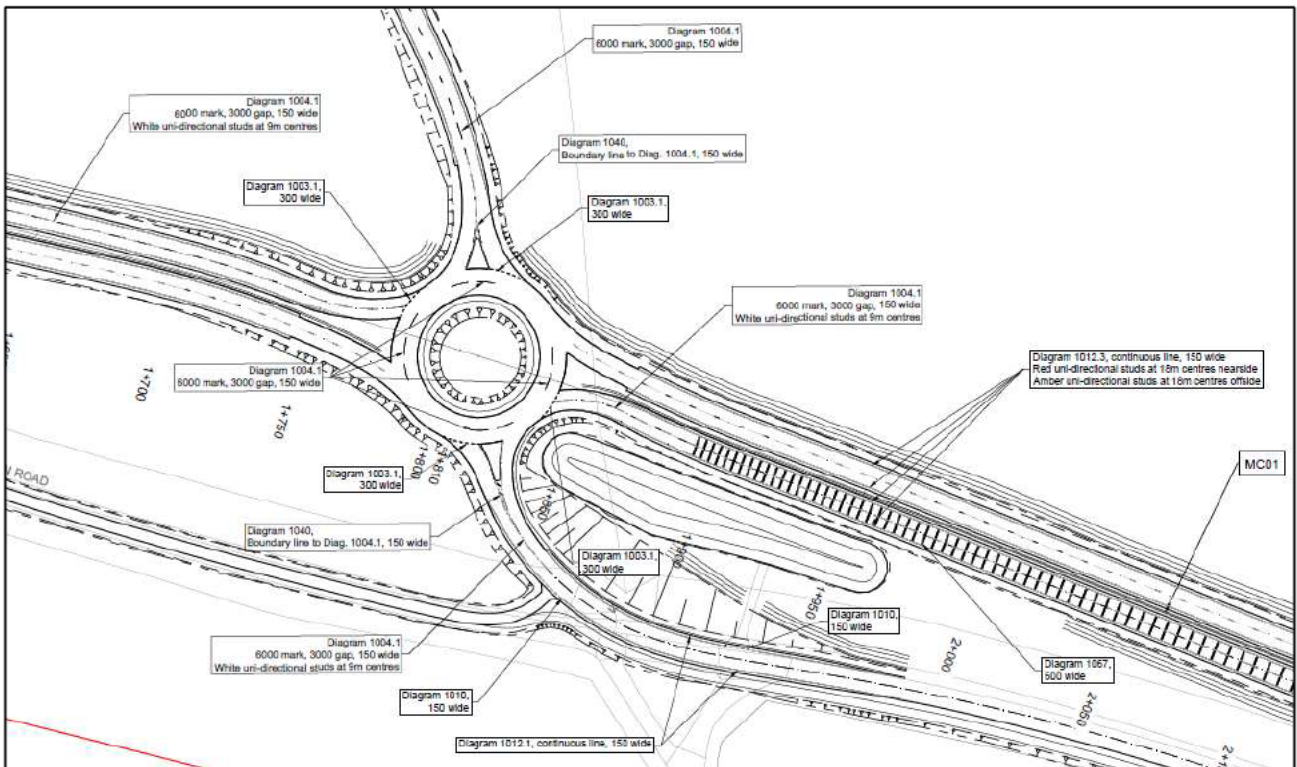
Plan extract: new Sutton Heath Roundabout
